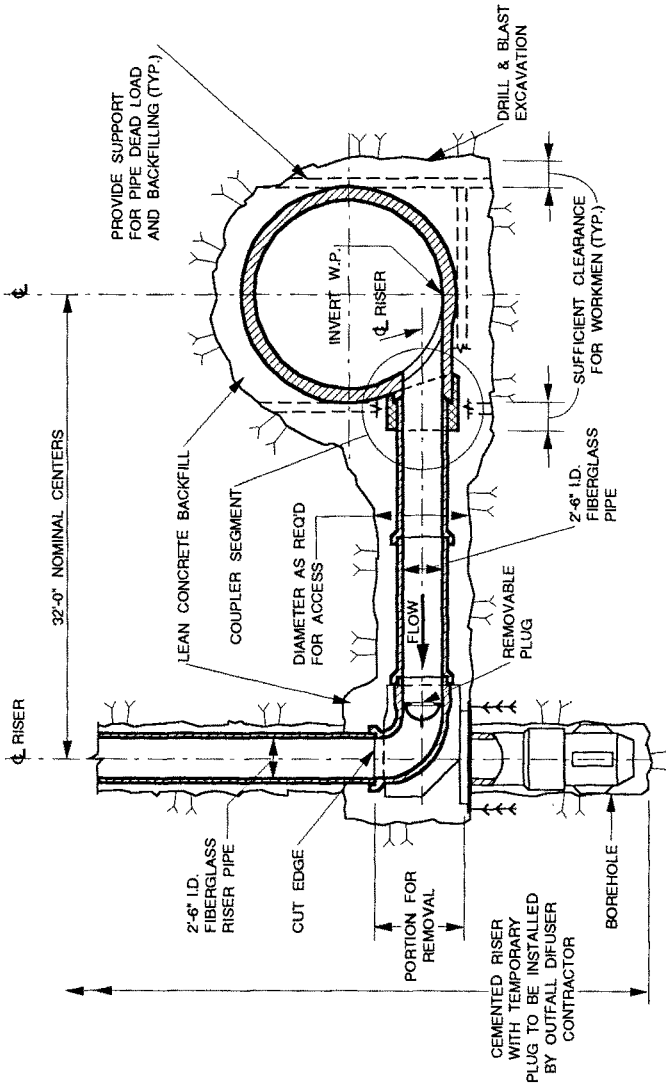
FIGURE & TUNNEL-DIFFUSER CROSS SECTION
